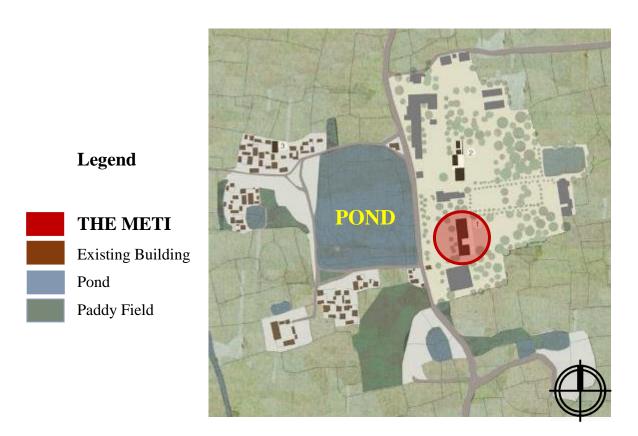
Site Plan for METI Handmade School, Rudrapur, Bangladesh (ArchDaily, 2010)
